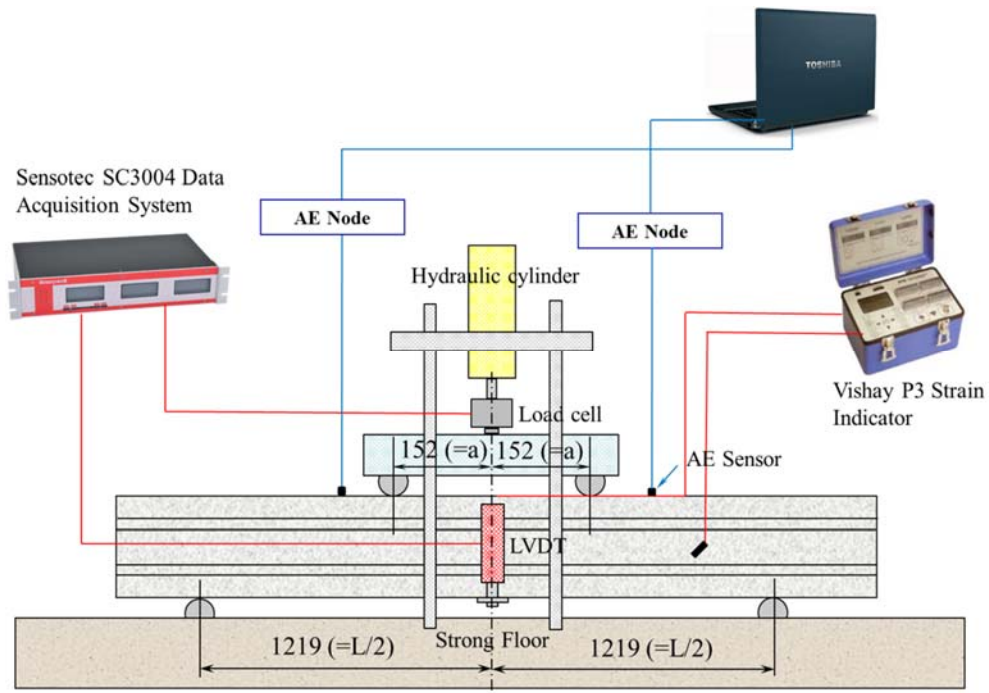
Test setup for stage-1 prestressed concrete beam.
